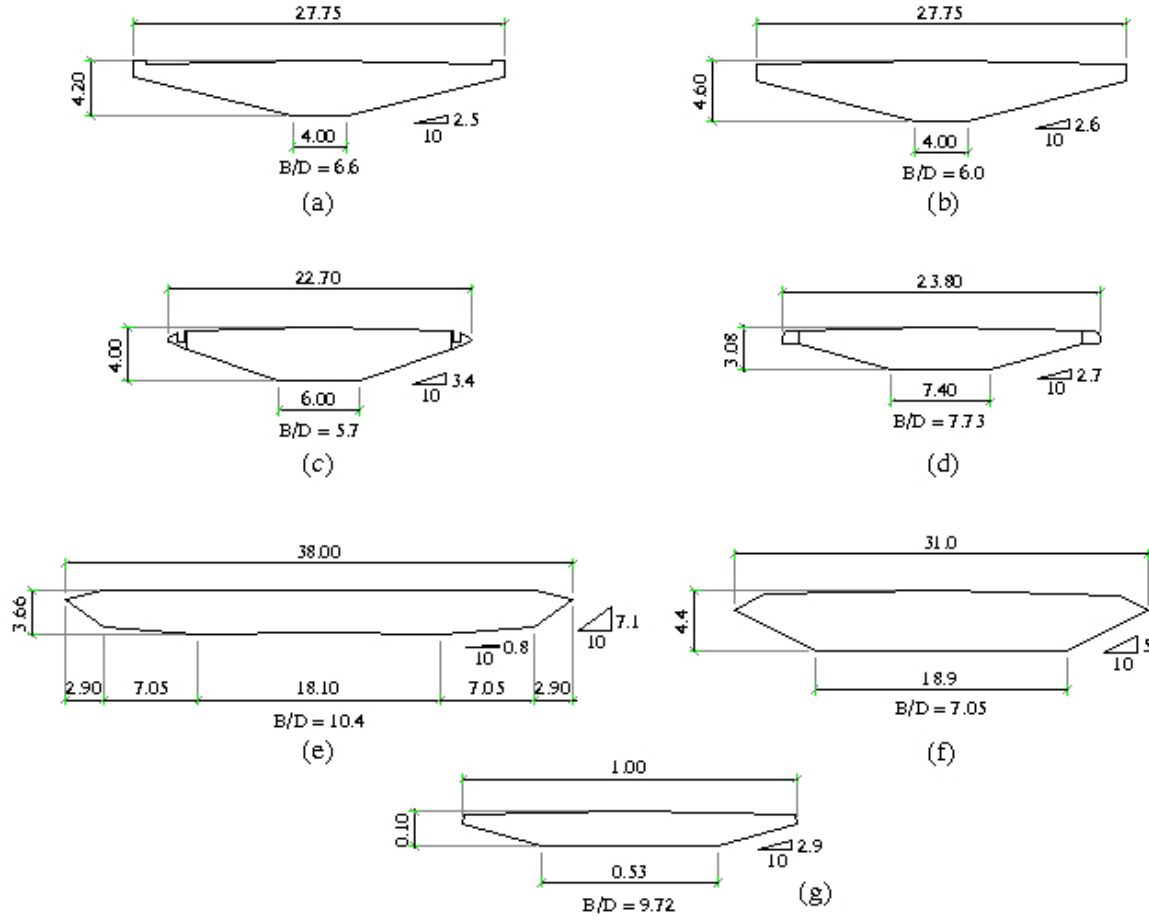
Cross-section geometry of the considered trapezoidal single-box girder decks: (a) Millau (metal version 1998); (b) Millau (concrete version 1998); (c) Grande Ravine; (d) Normandy; (e) Tsurumi; (f) Great Belt East Bridge; (g) Deck A
